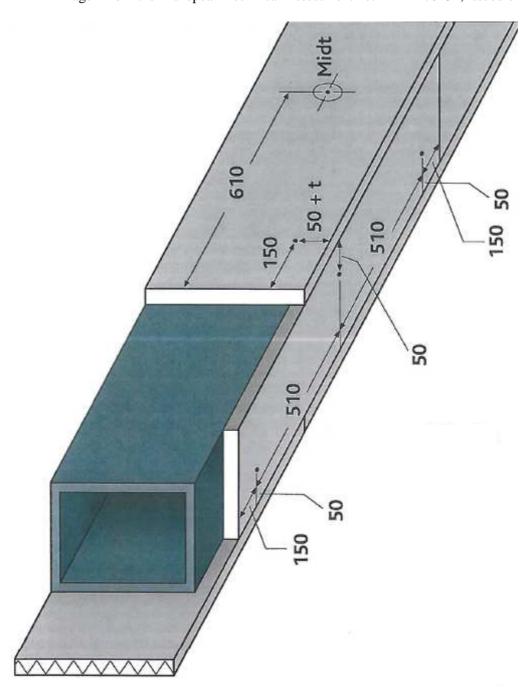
Position of shot nails in closed profiled steel – three sided Shot nails length 37 mm with $\emptyset 30$ mm washer used for 25 mm fire protection Shot nails length 62 mm with $\emptyset 30$ mm washer used for 50 mm fire protection Midt = centre
